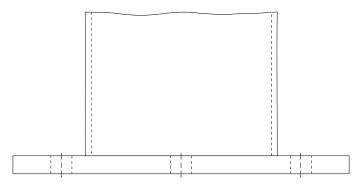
DETAIL G TUBULAR STEEL 6" x 4" x 1/4" BASEPLATE ASSEMBLY SIDE ELEVATION
